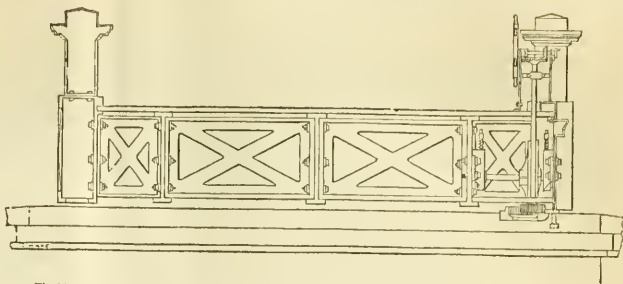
Section of the swing bridge, showing the machinery for opening and closing it.
